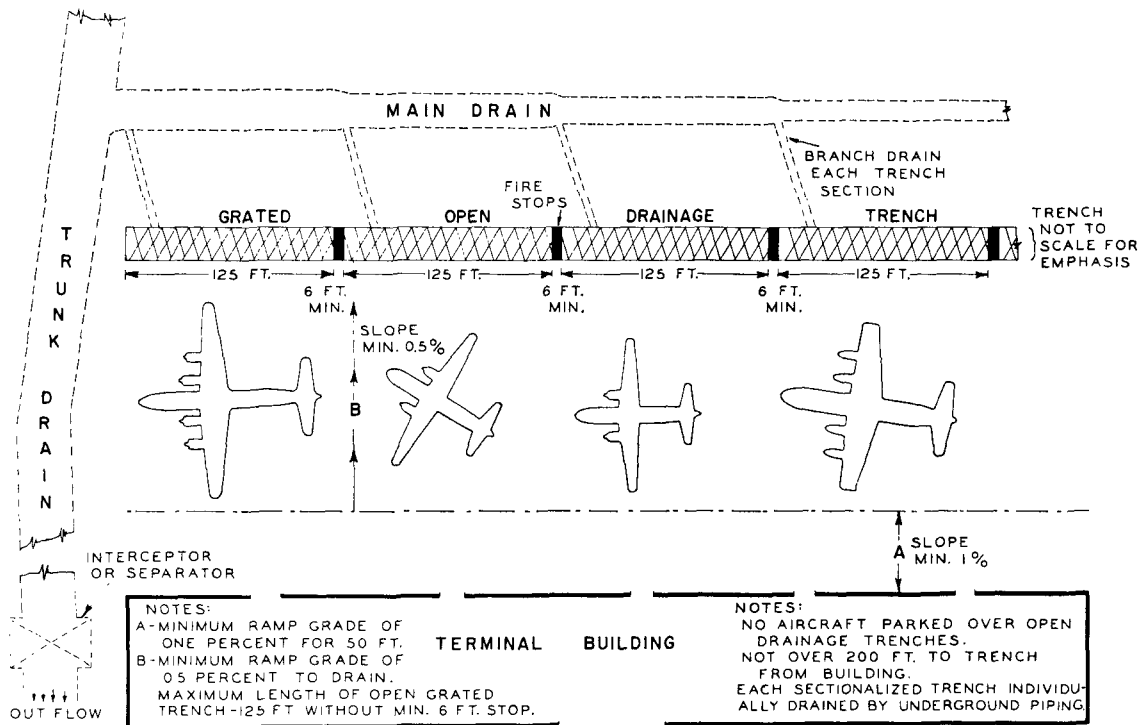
Another possible arrangement of an aircraft fueling ramp drainage system using a grated open drainage trench.
